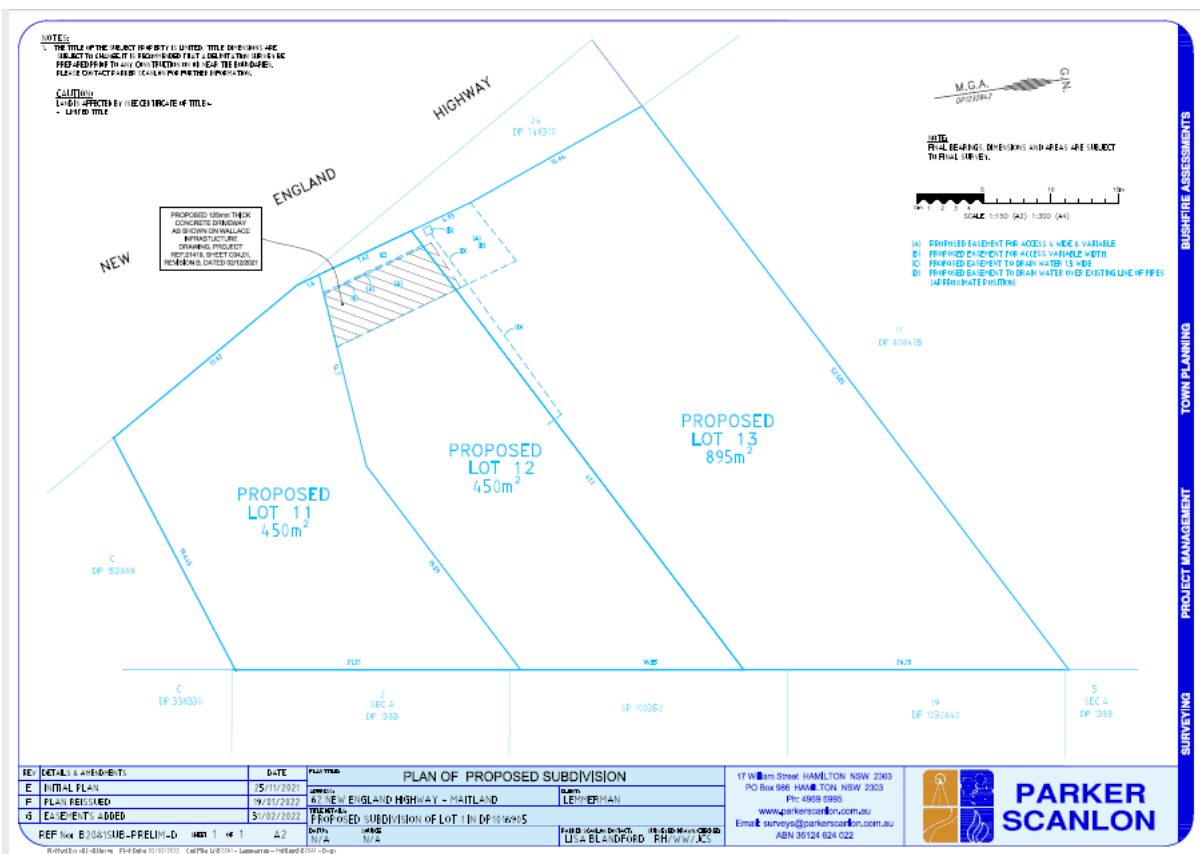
Plan of Proposed Subdivision (Parker Scanlon, January 2022)
